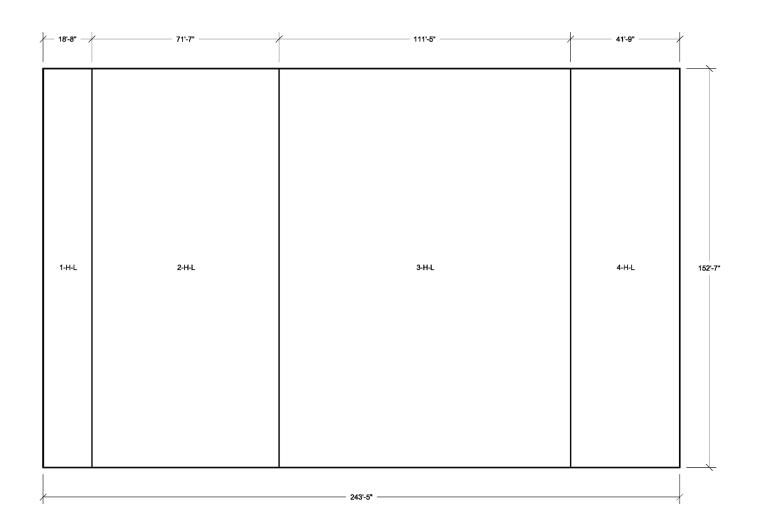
H.3-28 Basemat Looking Down East-West Reinforcement Zones Near Side Face
